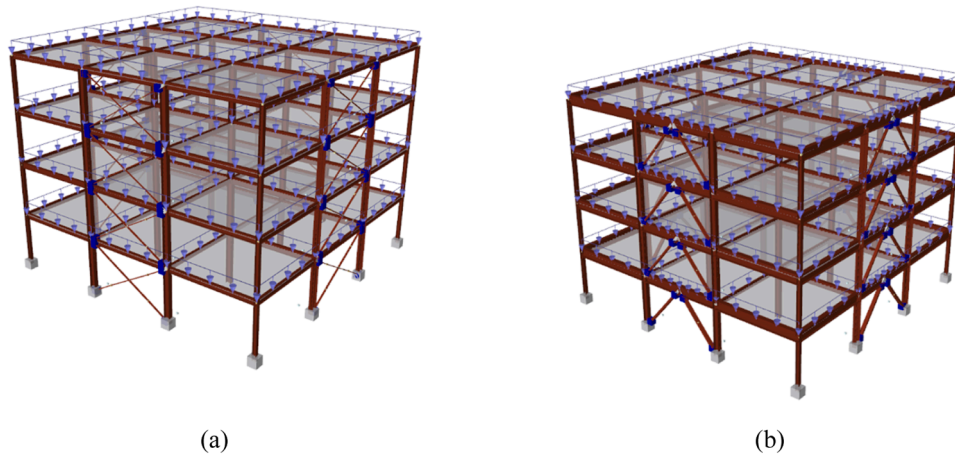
Axonometric view of structural models for (a) STR1 and (STR2) buildings.
